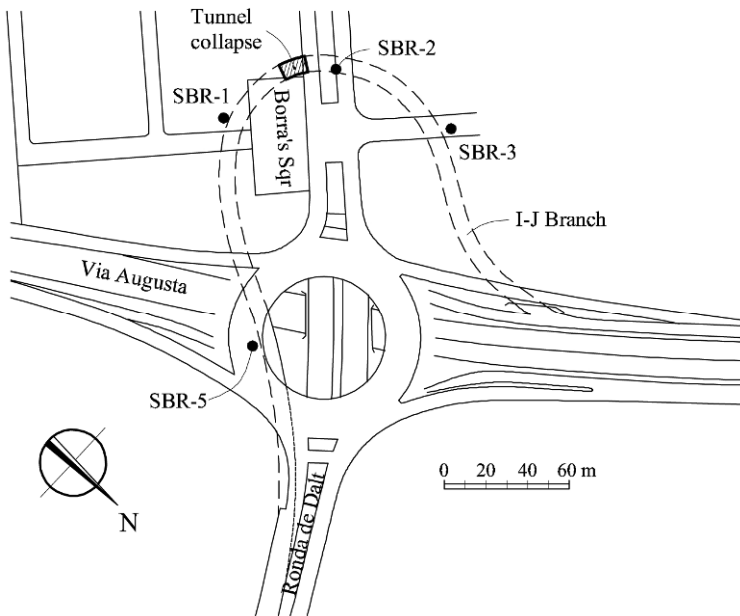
Plan view of tunnel showing the failed section and the position of borings.
